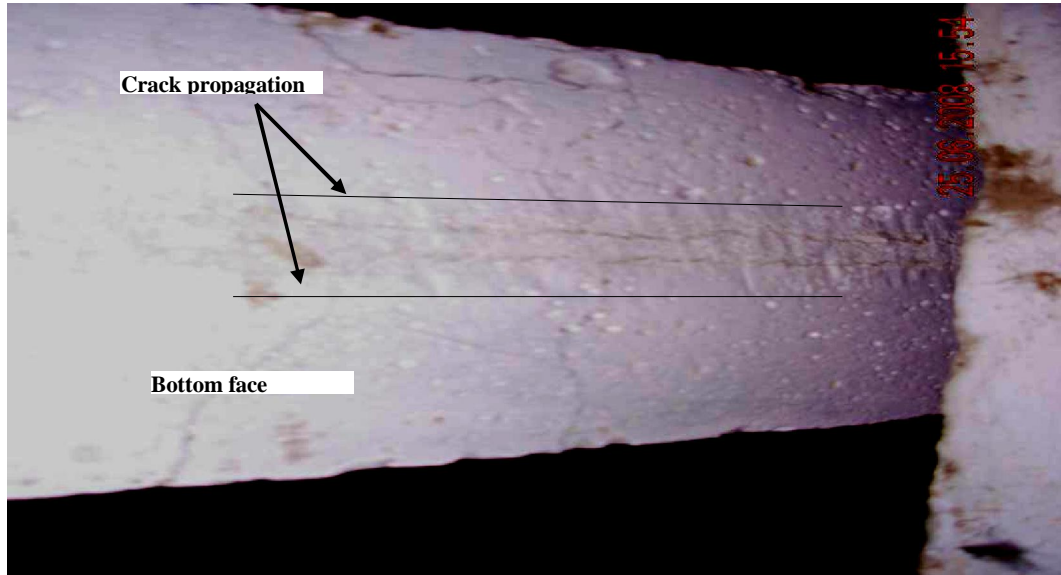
Test RWS crack at interface of epoxy mortar and concrete at bottom face
